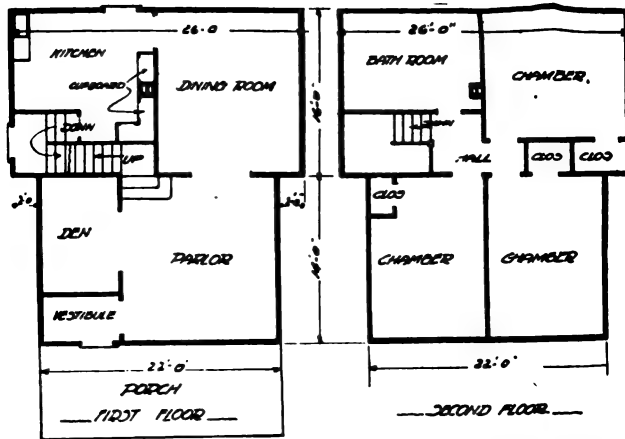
FLOOR PLANS, CONCRETE BLOCK HOUSE COSTING \$2,500
